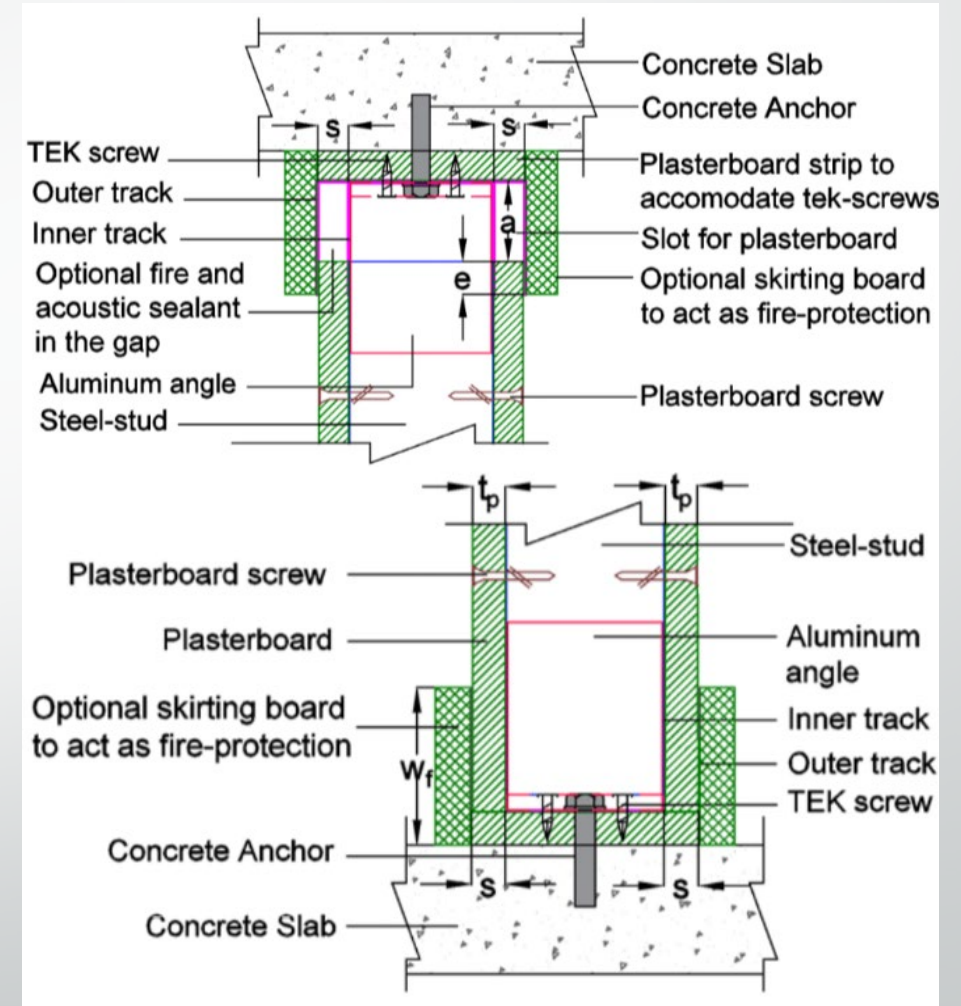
Section drawings of the top and bottom DST connections [Bhatta, 2022]
